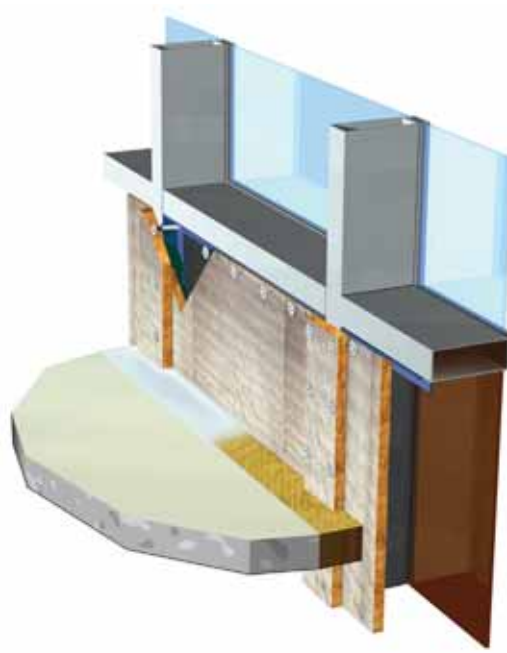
Correct manner to fire-stop a curtain wall/floor intersection per ASTM E2307
